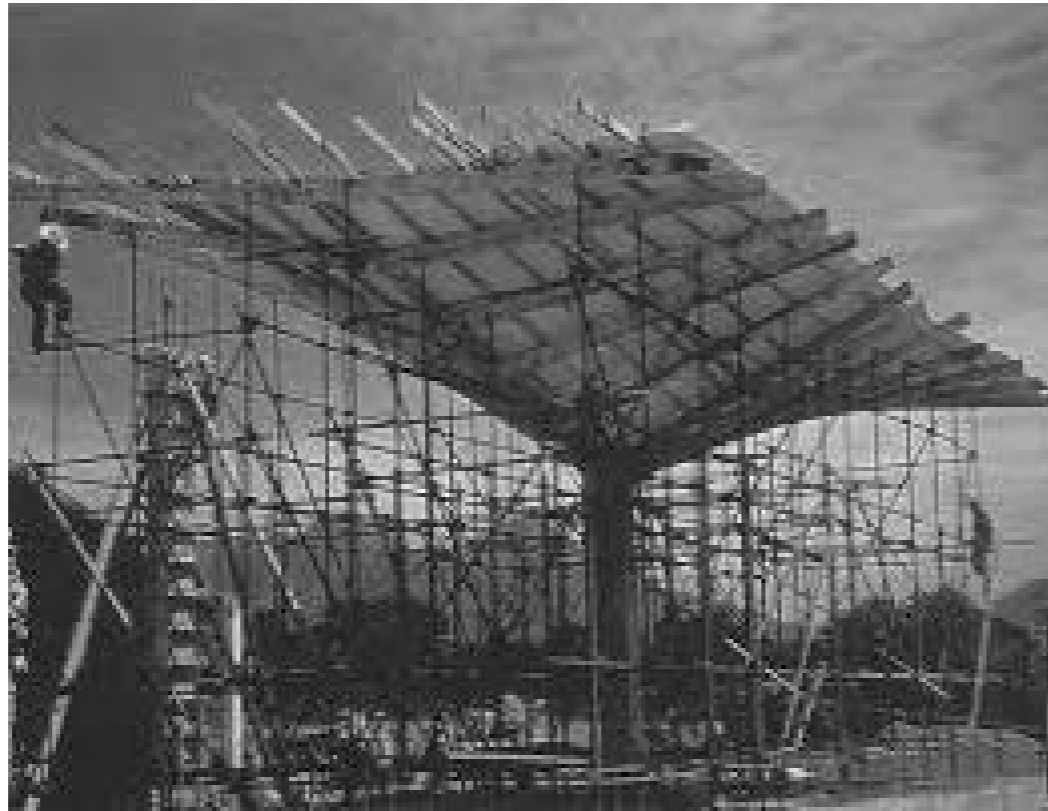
Felix Candela thin reinforced concrete inverted umbrella shell project built in Mexico, Formwork and Elevation View.
